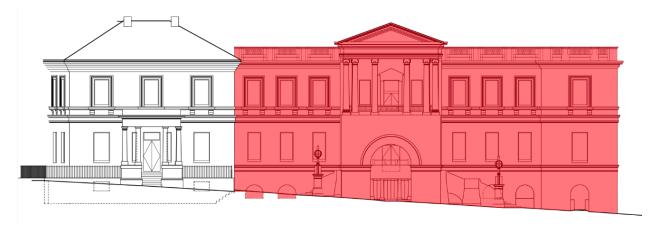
Diagram indicating building stage relevant to this section of the Historical Overview shaded red Source: Urbis
